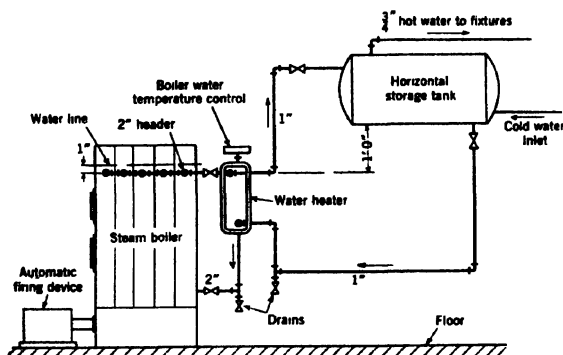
INDIRECT WATER HEATER MOUNTED ON SIDE OF BOILER
